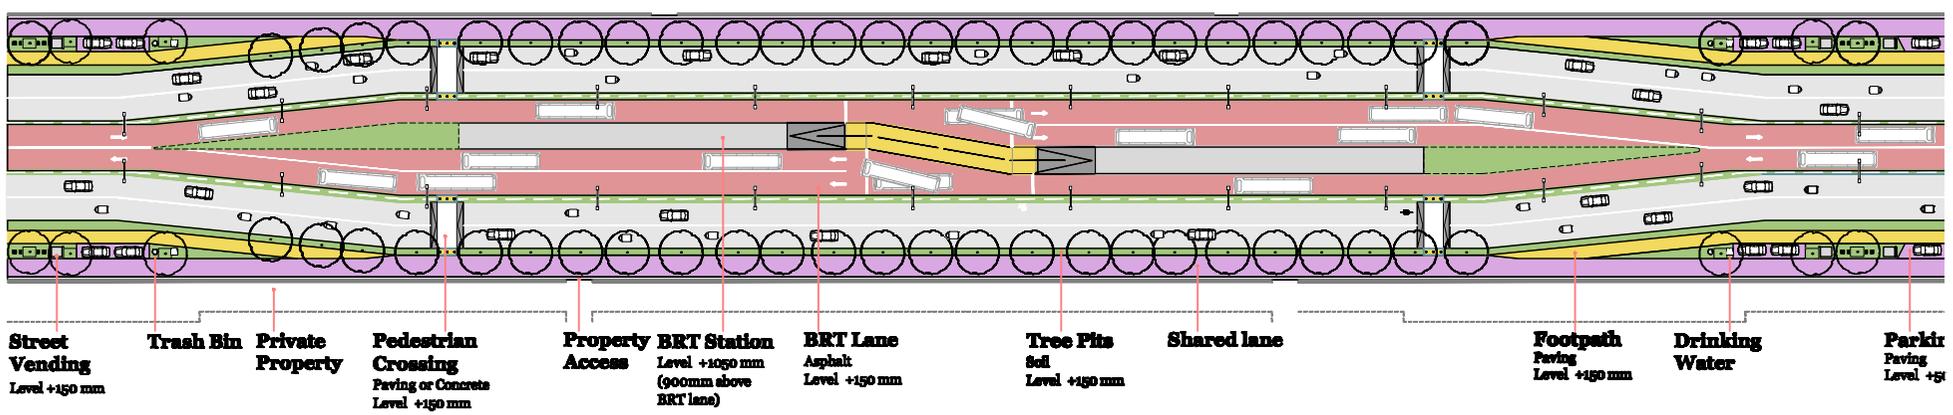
Plan showing typical design for BRT corridors with 40 M ROW
